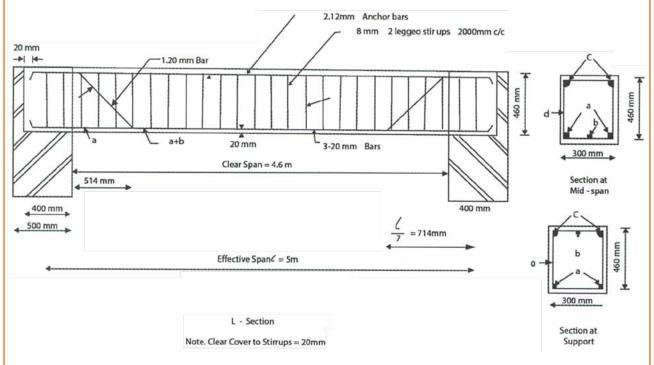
Reinforcement Details of a A simply supported RCC beam
